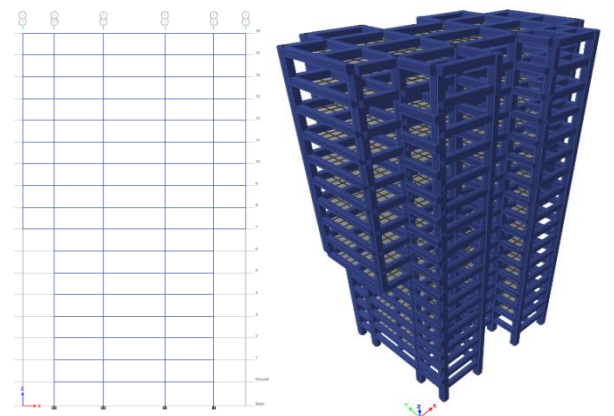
(b): Typical Elevation and 3D view of Building model with Floating Column for stiff, medium stiff and soft soil
